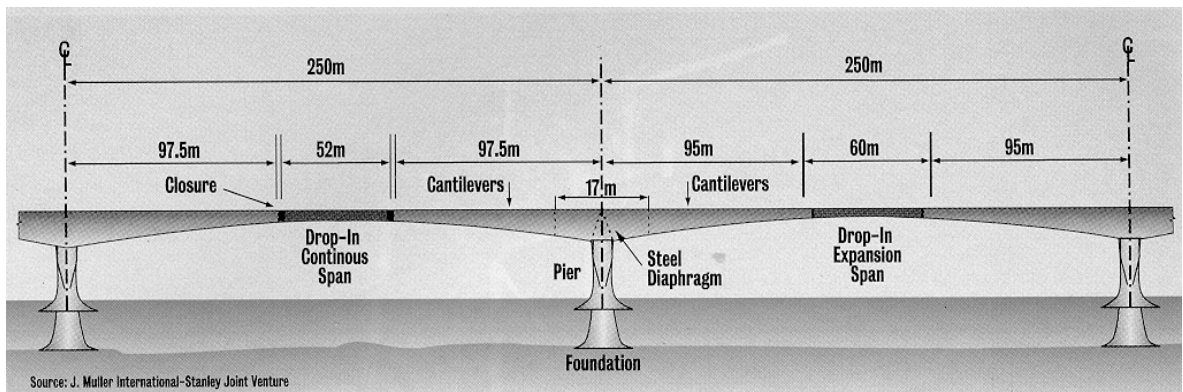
Drop-in panels connecting haunched girder segments at the Northumberland Strait Crossing [19]
